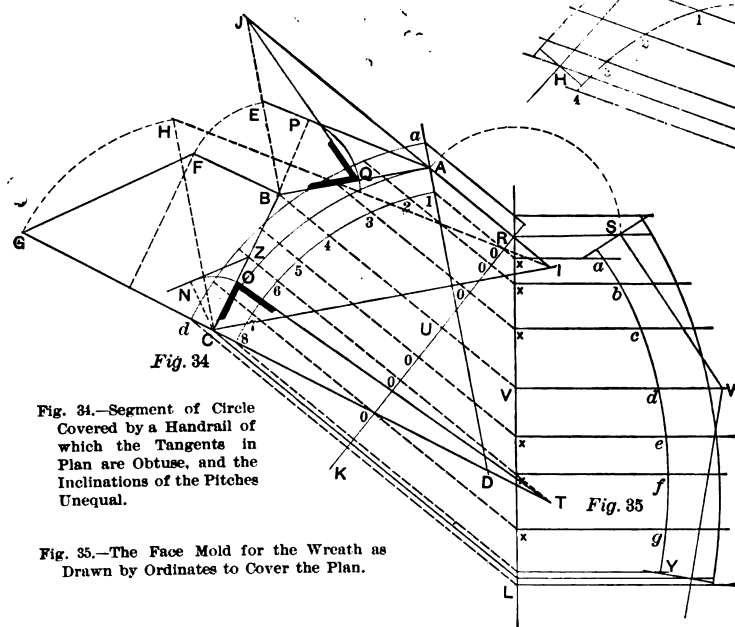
Segment of Circle Covered by a Handrail of which the Tangents in Plan are Oblique, and the Inclinations of the Pitches Unequal.
